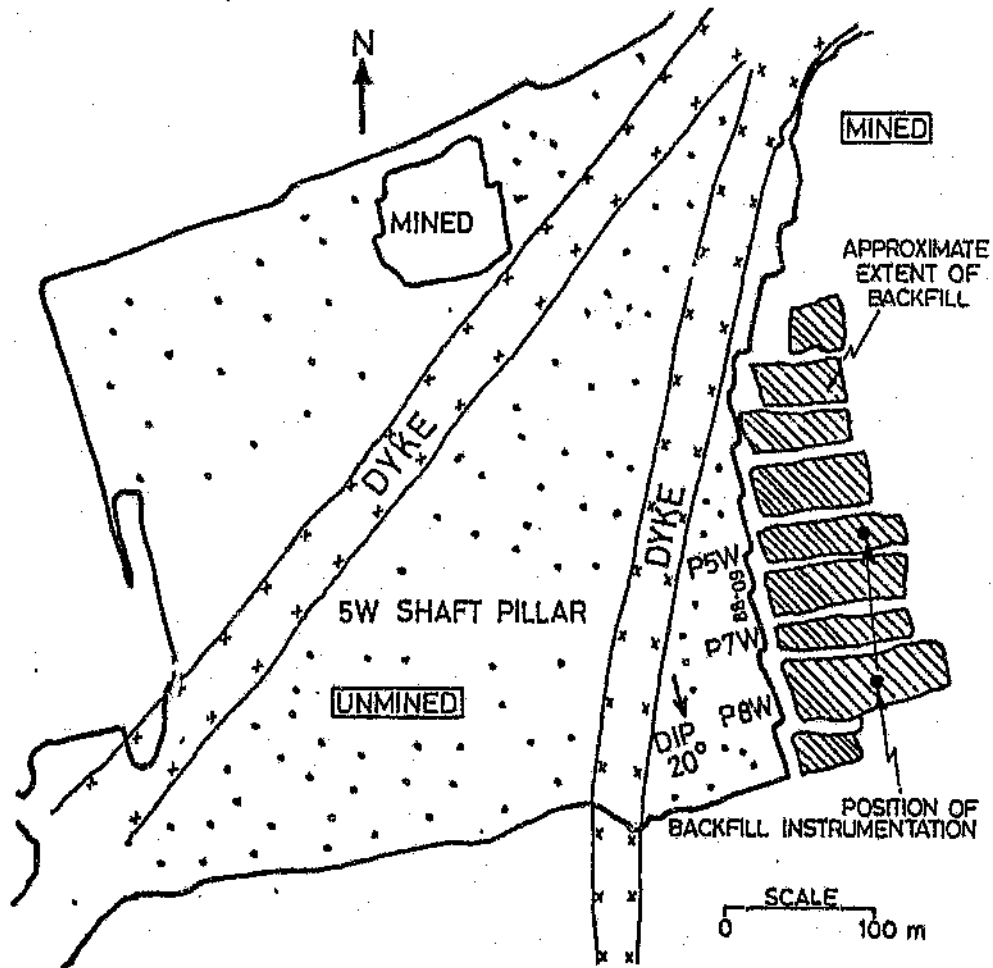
Plan of the 5 West Shaft Pillar with extraction and backfilling taking place on the eastern side. The positions of the instrumentation are also shown.
